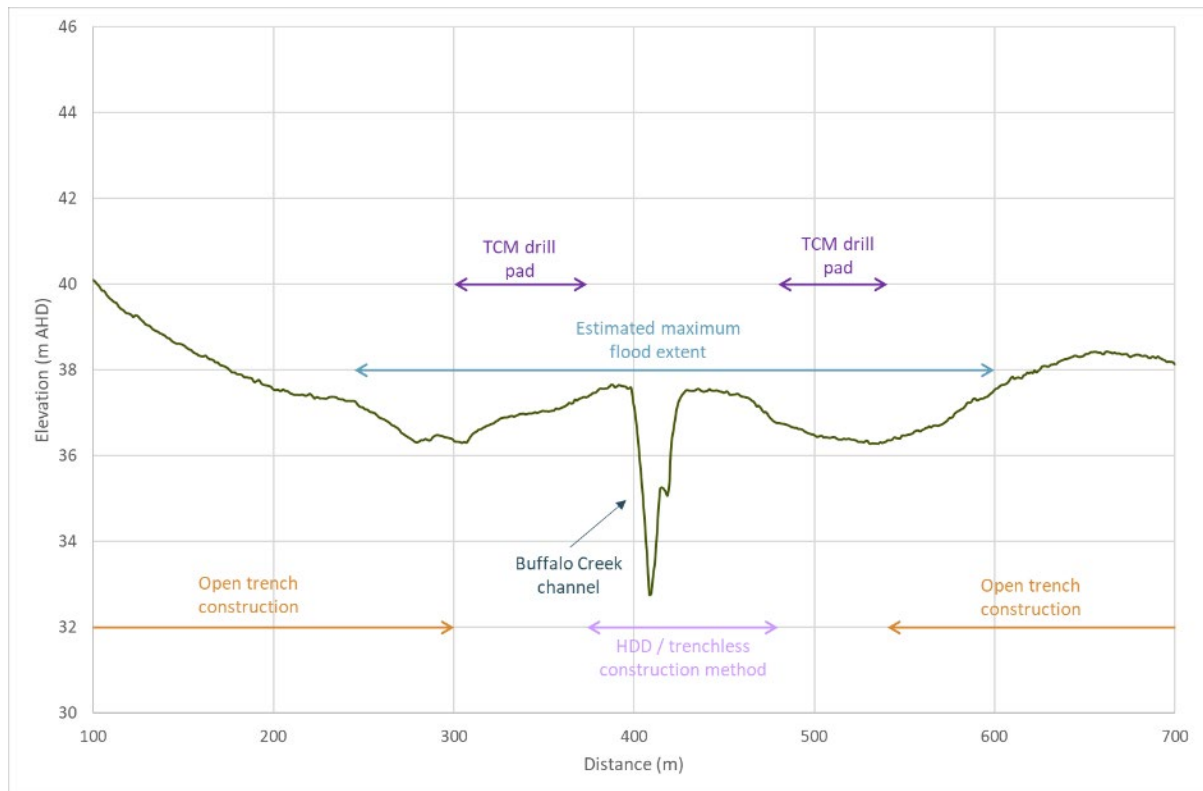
Schematic cross section layout of construction assets surrounding Buffalo Creek crossing, looking downstream along proposed project alignment
